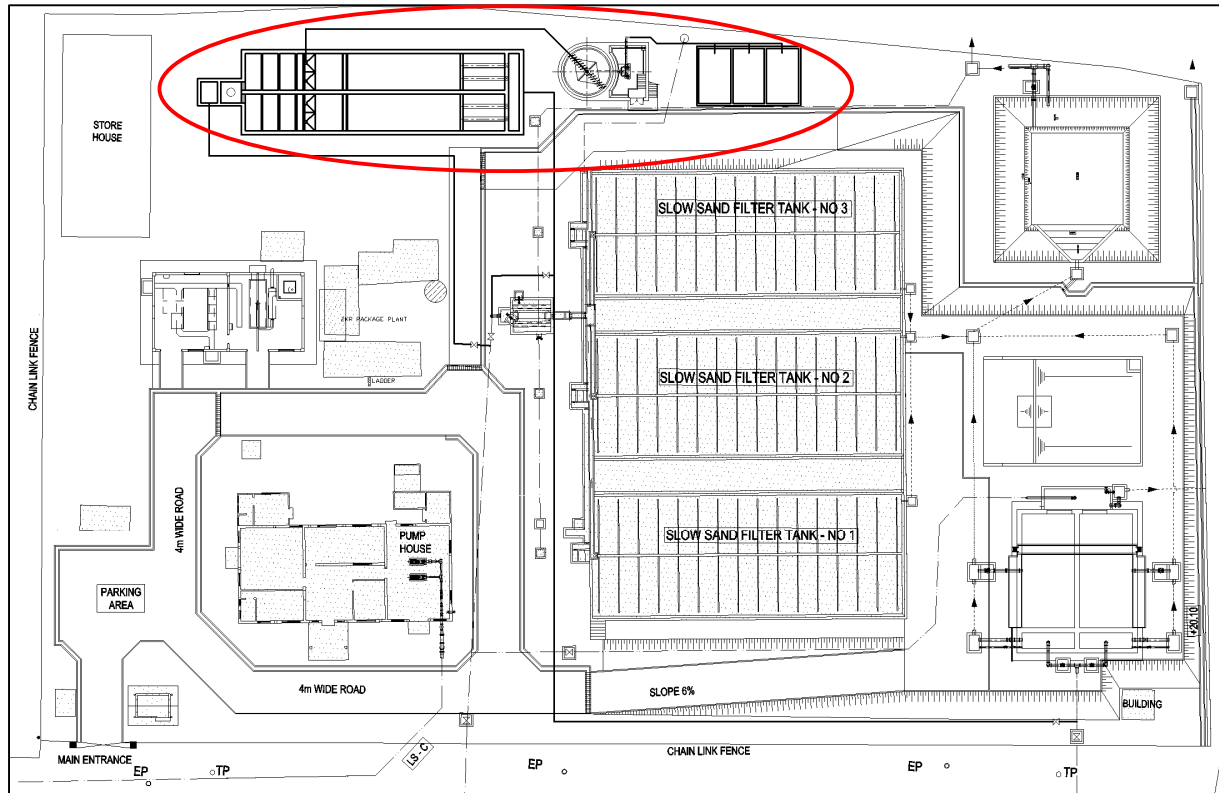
Layout Plan of Pre-Treatment Facilities
